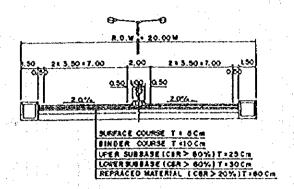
Typical Cross Section of Route -2 (Two-way Section)
